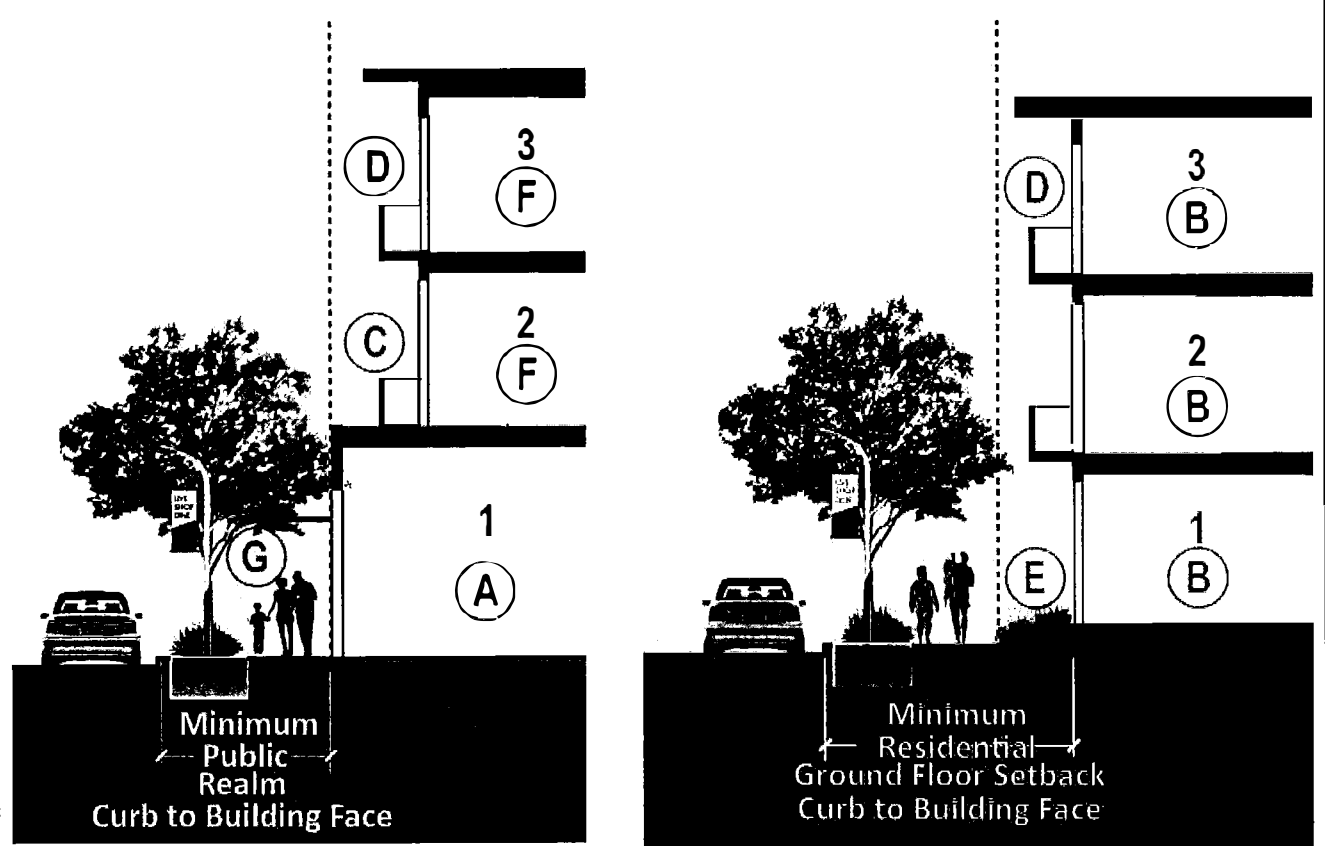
Building Placement & Activation Diagram – One & Two Stories
